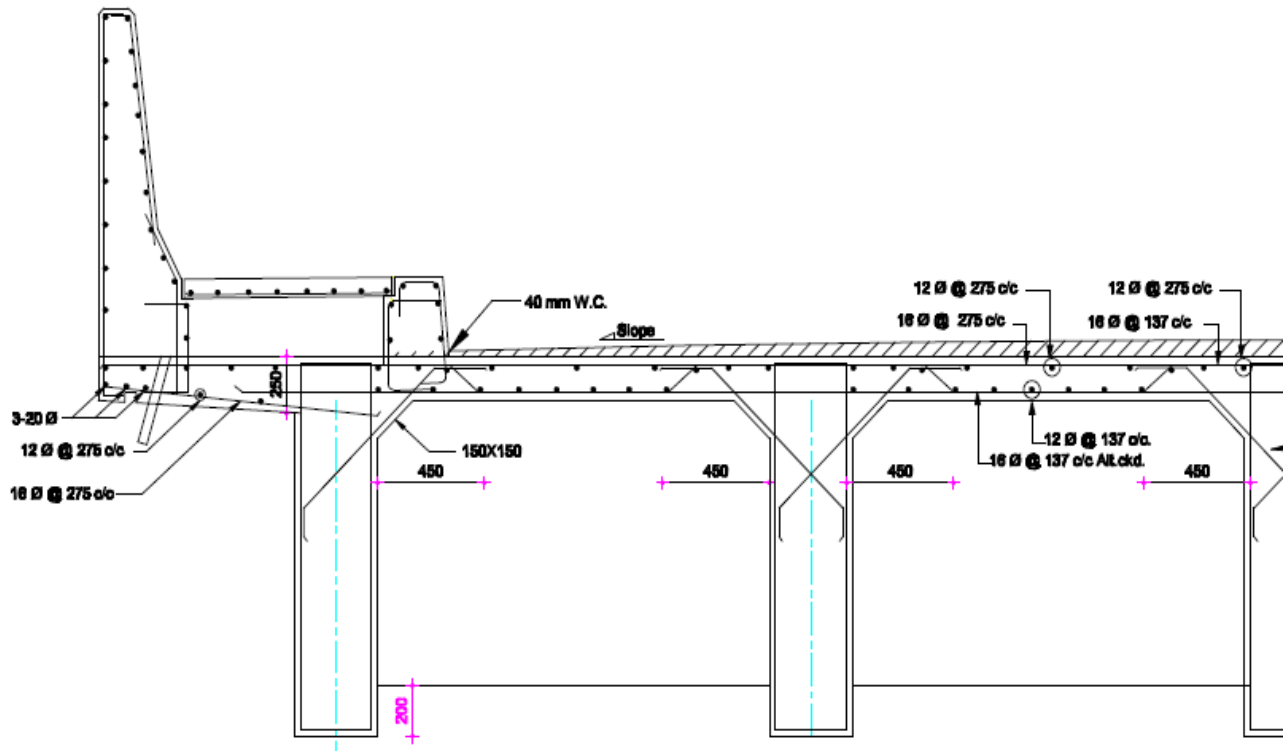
Reinforcement Details of a Typical Bridge Deck of a Span of 21m ( Roads & Highways Department, Bangladesh, 2016)
